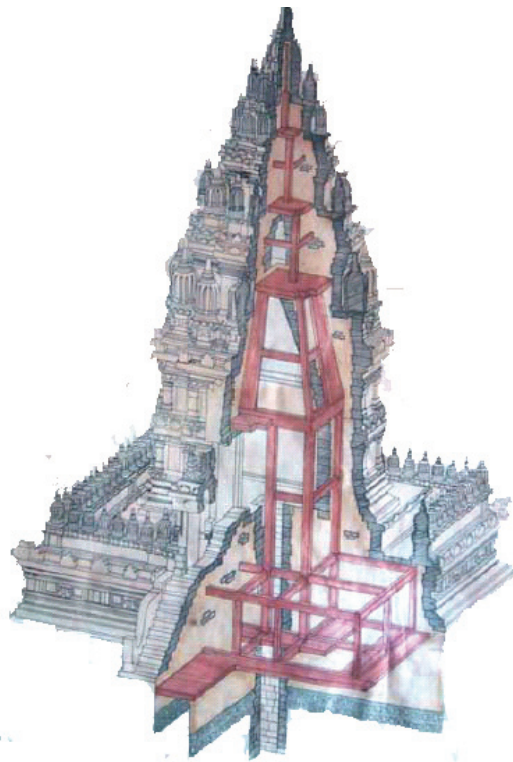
3D view of how the reconstruction of Wahana (UNESCO, 2004)³. The concrete frame is shown in shaded area.
